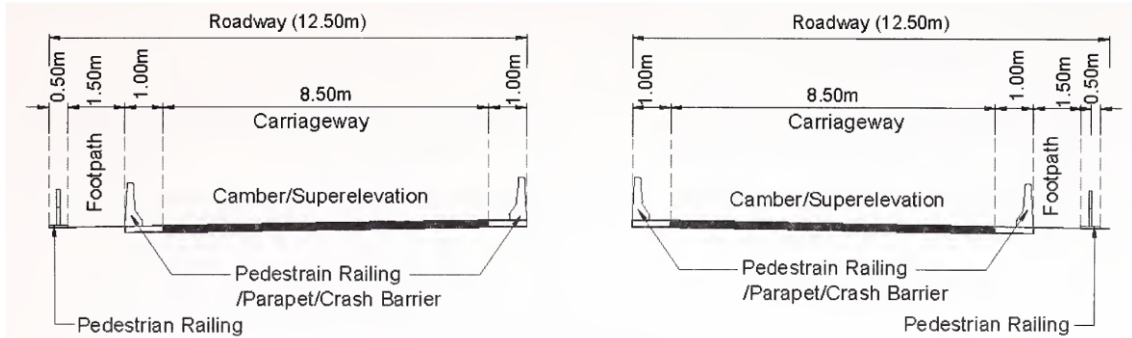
A : Cross Section of Bridge at Deck Level - with Footpath
